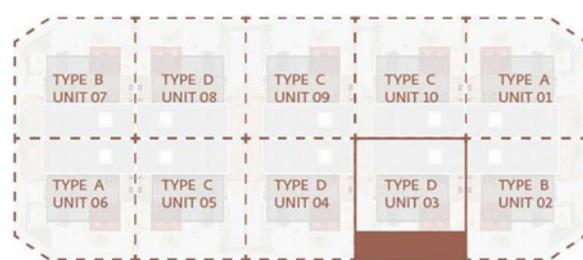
Master plan of TAG Villa project (ANOS, n.d.)
